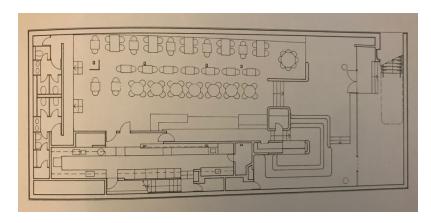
Lower Ground floor plan. Drawn Ted Quinton 2006.
